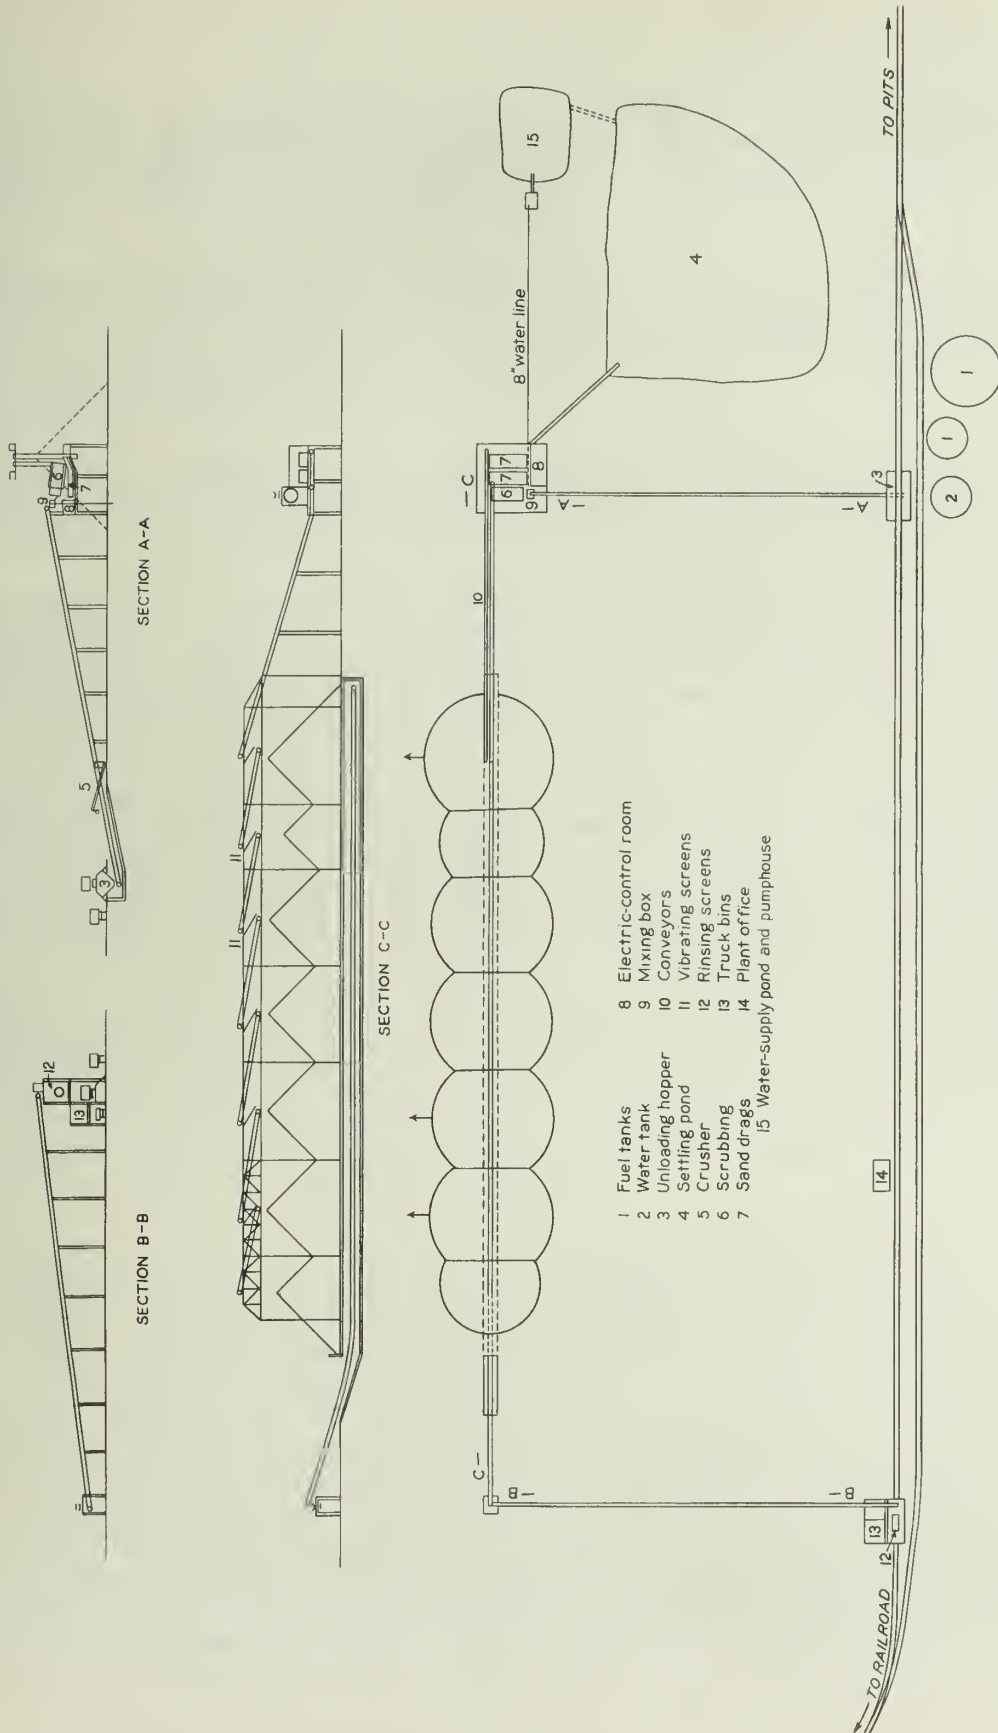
Plan of Quigley plant, Hart Spur, Tex.
